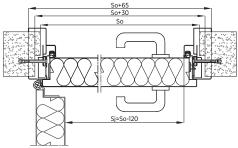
Installation of a single-leaf door to a masonry wall – wrap-around frame with a thermal break – horizontal cross-section
